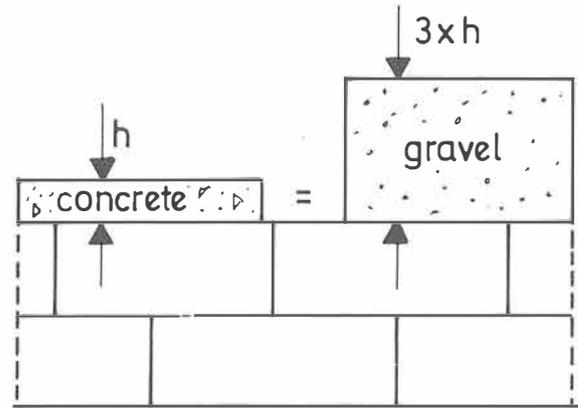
If the concrete slab is omitted, the pavement thickness will have to be increased.
